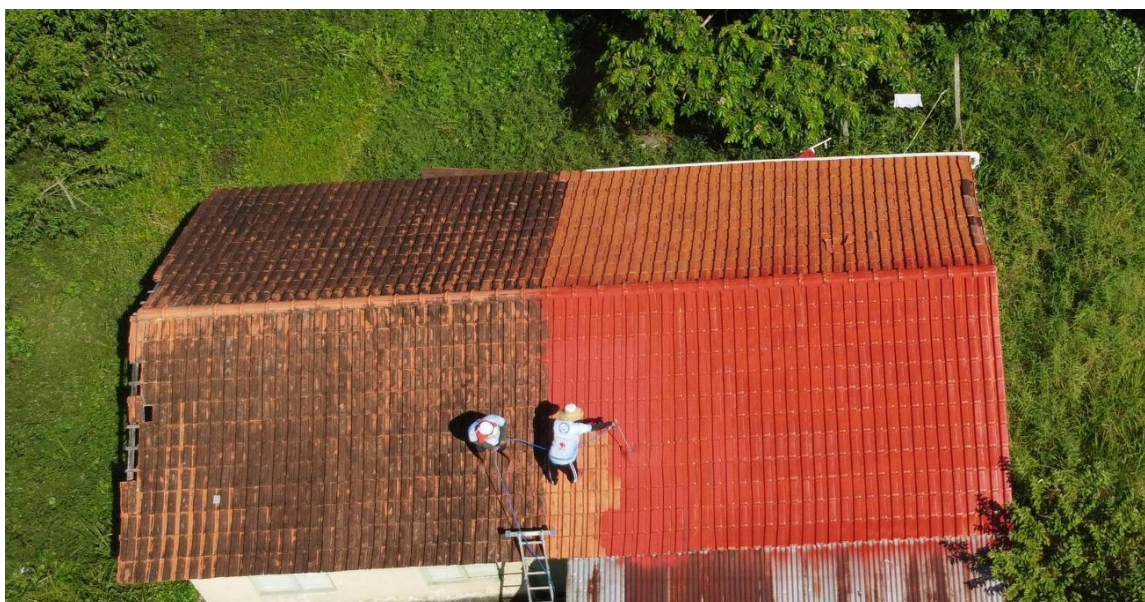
Drone view of the painting of the first layer of roof with the use of an airless painting equipment, Villa Olivença.
